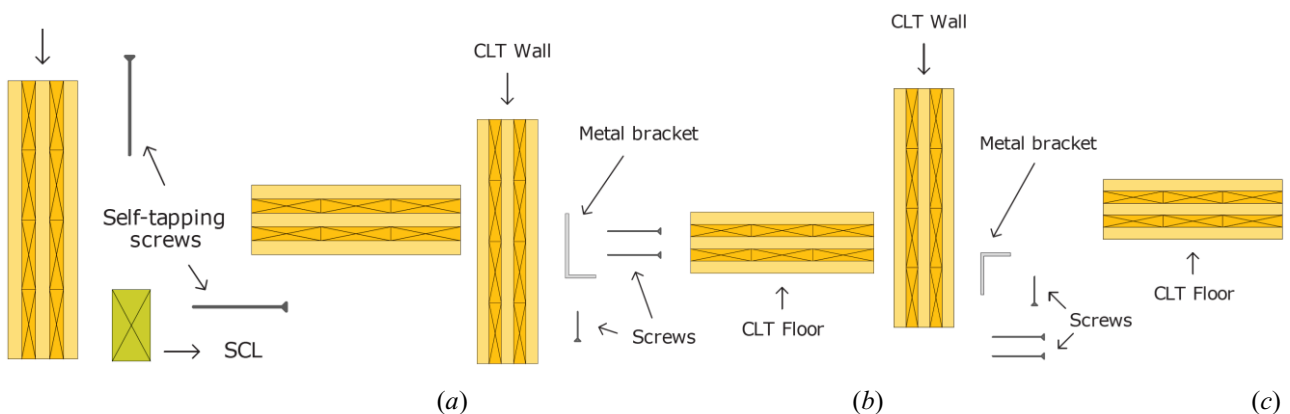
Wall-to-floor connections for balloon CLT constructions: (a) wooden bearing support [39] and (b-c) metal bracket (images credits: CLT Handbook [39]).
